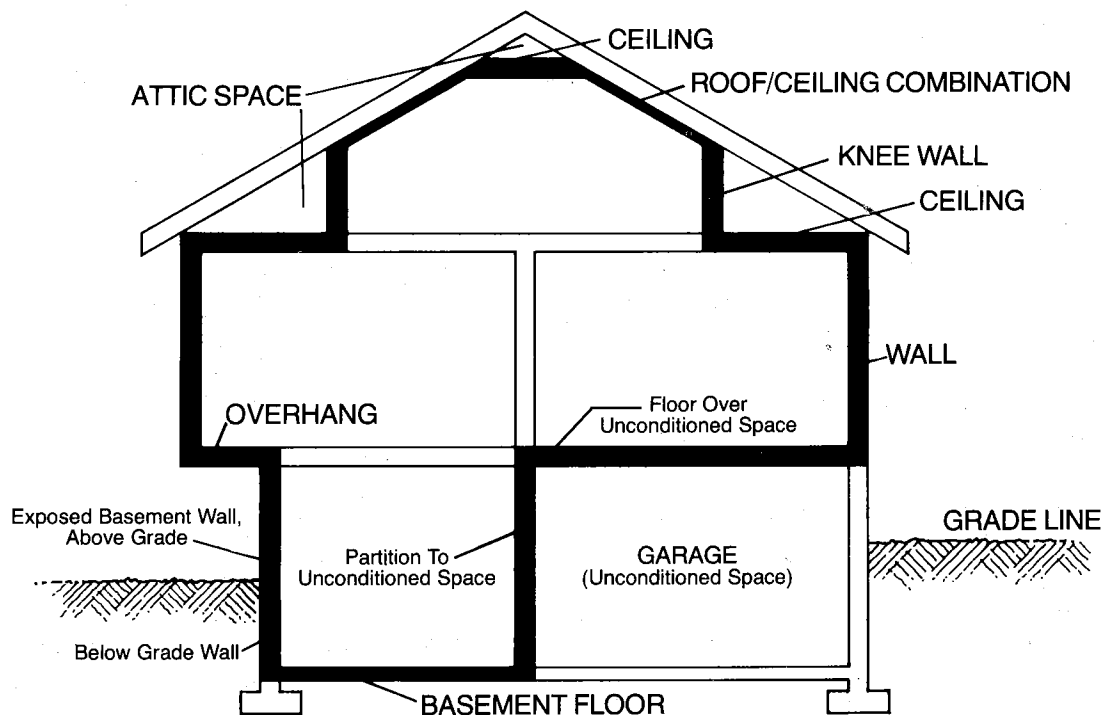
Building Surfaces Next to Outside and to Unconditioned Spaces
